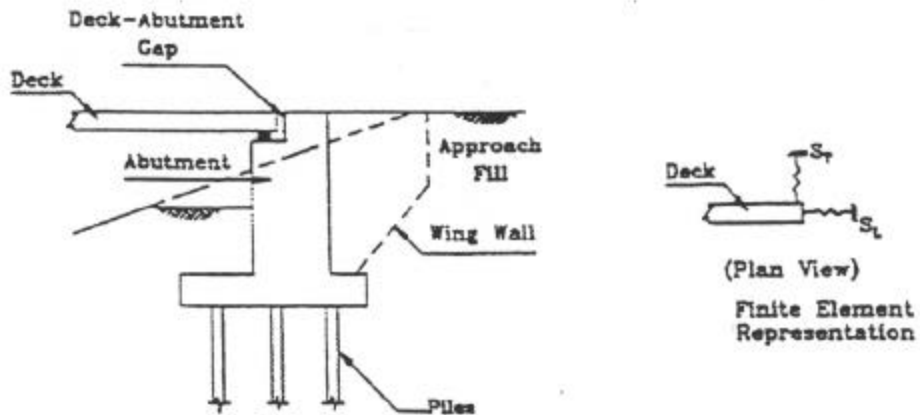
Representation of Deck-Abutment-Backwall Foundation Interaction (Siddharthan et al. 1998)
